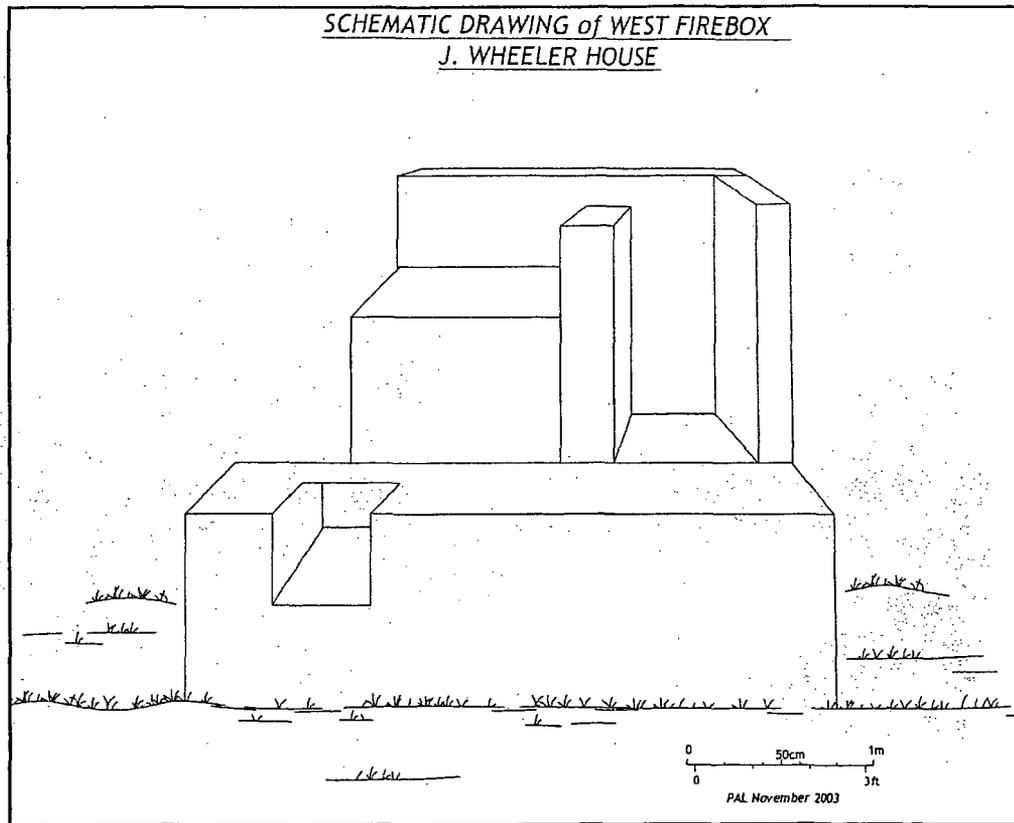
Schematic drawing of the west firebox of the J. Wheeler House chimney stack, Yankee Rowe project area, Rowe, Massachusetts.
